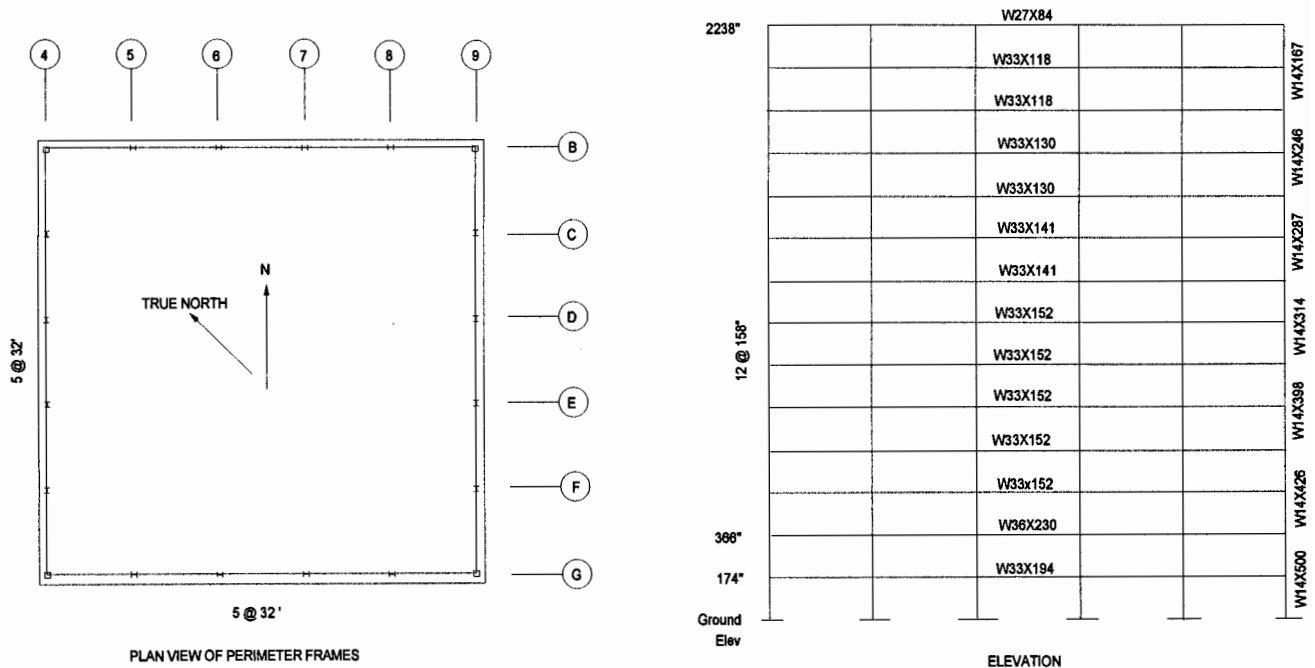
Plan and Elevation of Perimeter Frames of Blue-Cross Building
